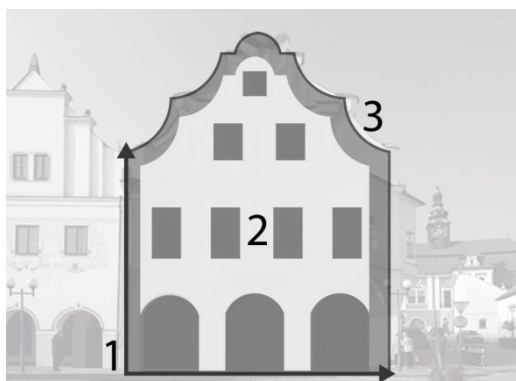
"Fahra House" facade analysis": resistant structures 1) scale and basic dimensions of the building; 2) proportions, situation of window and doors openings; 3) general silhouette of the building. Source: drawing by author
